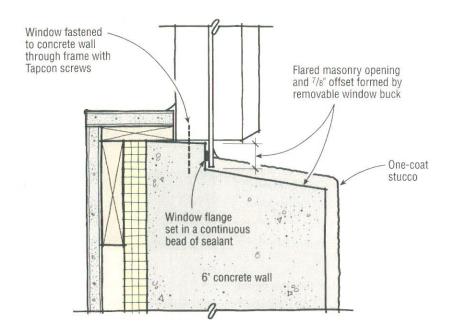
Windows are installed from the outside of the wall and are pressed into a continuous bead of silicone sealant against a ⁷/8-inch offset lip cast in the opening. The installation tolerance is tight, typically only about ¹/4 inch over the unit dimension, to minimize air infiltration around the window.
